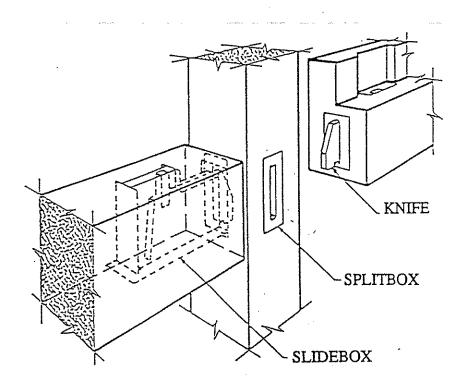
The BSF prefabricated beam-to-column shear connection. The steel knife from the beam is slipped into the column splitbox [adapted from Østspenn Holding A/S 1991].
